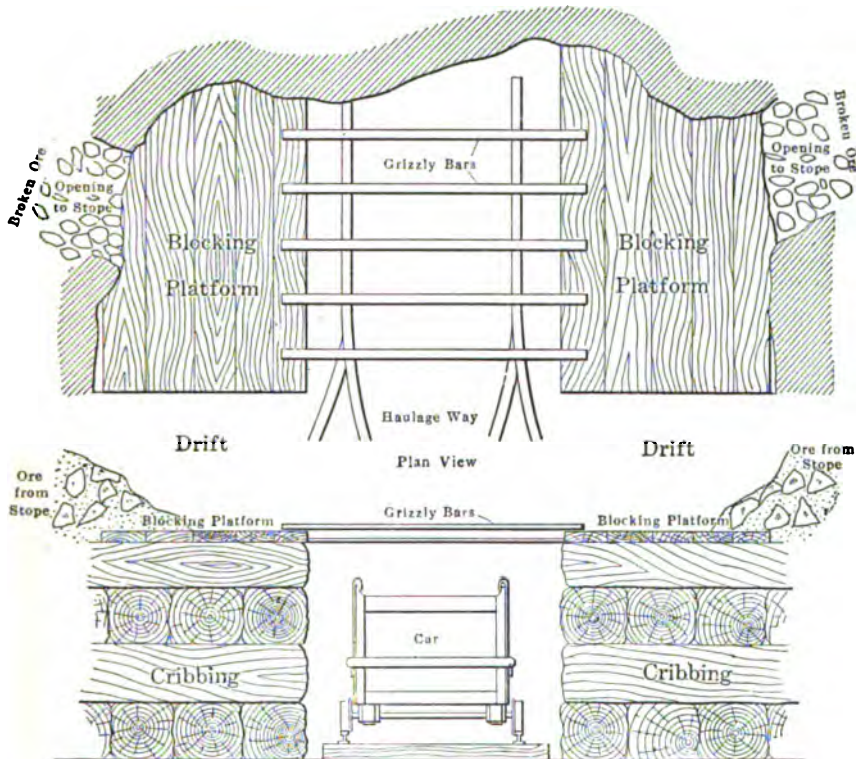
ARRANGEMENT AND CONSTRUCTION OF UNDERGROUND GRIZZLY.
